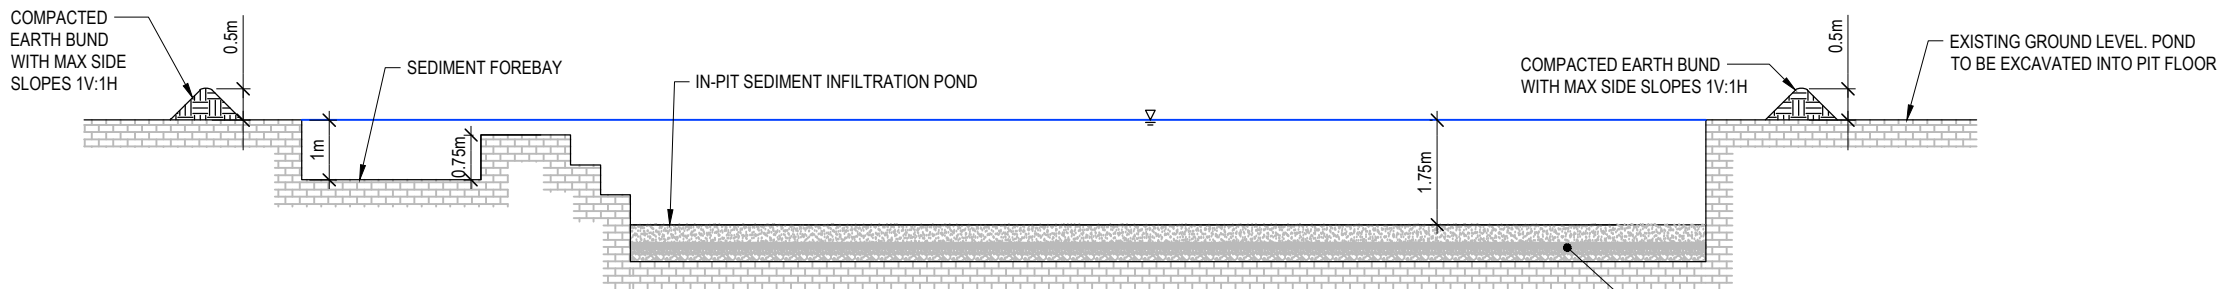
IN-PIT SEDIMENT INFILTRATION POND CROSS-SECTION
